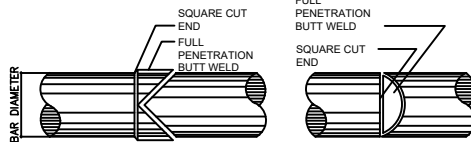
TYPICAL WELD SPLICE DETAIL
